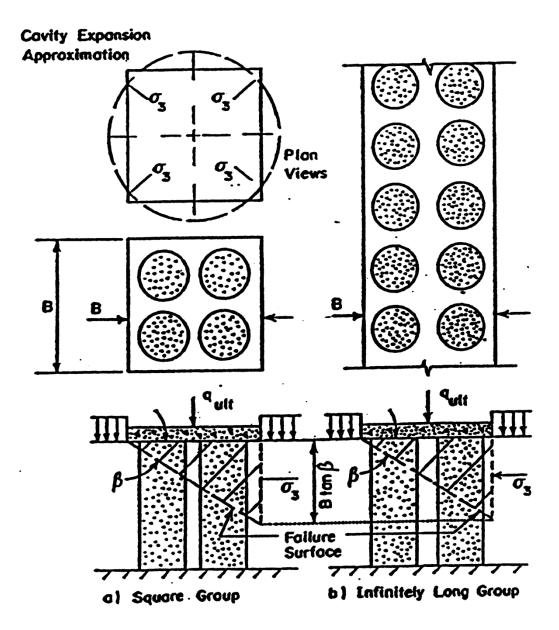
12: Stone column group (Barkslade & Bachus, 1983)
